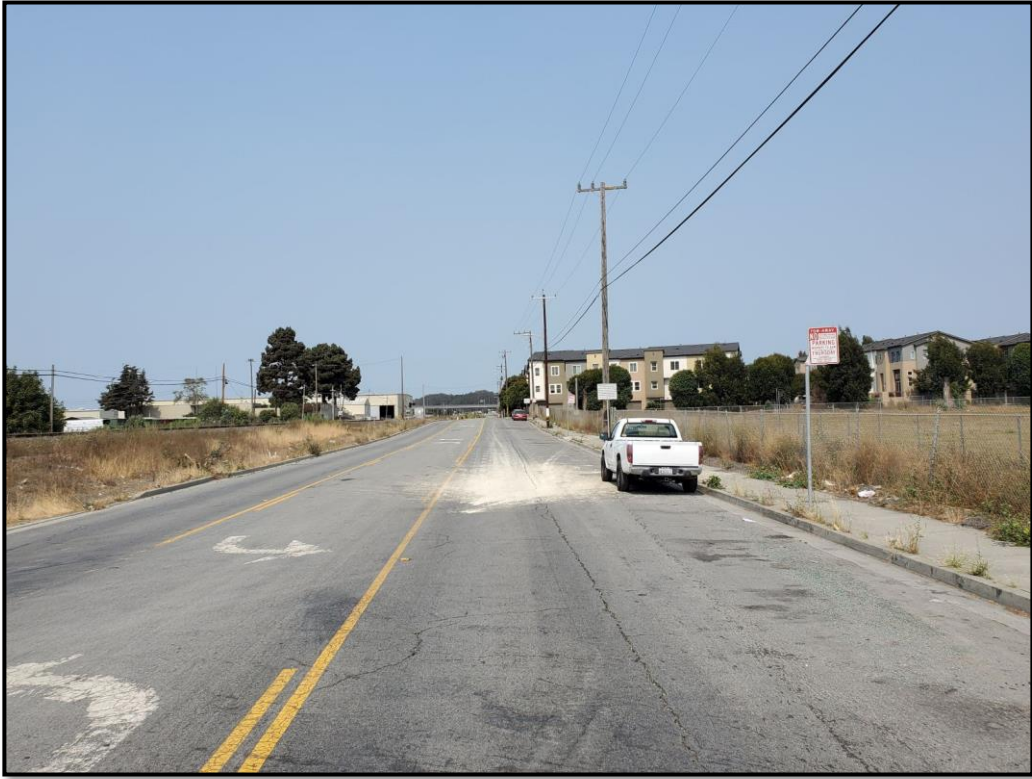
Giant Road, between Trenton Boulevard and Lake Street (looking north)
